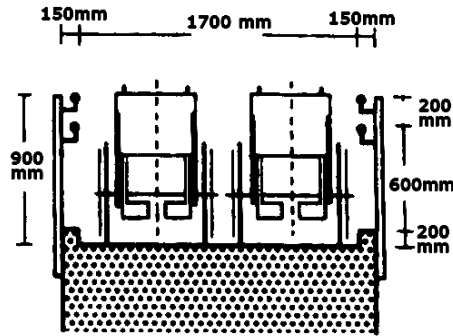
Section of new ramp design with, the vertical rise is 200 mm, and the height of handrail is 900mm .
